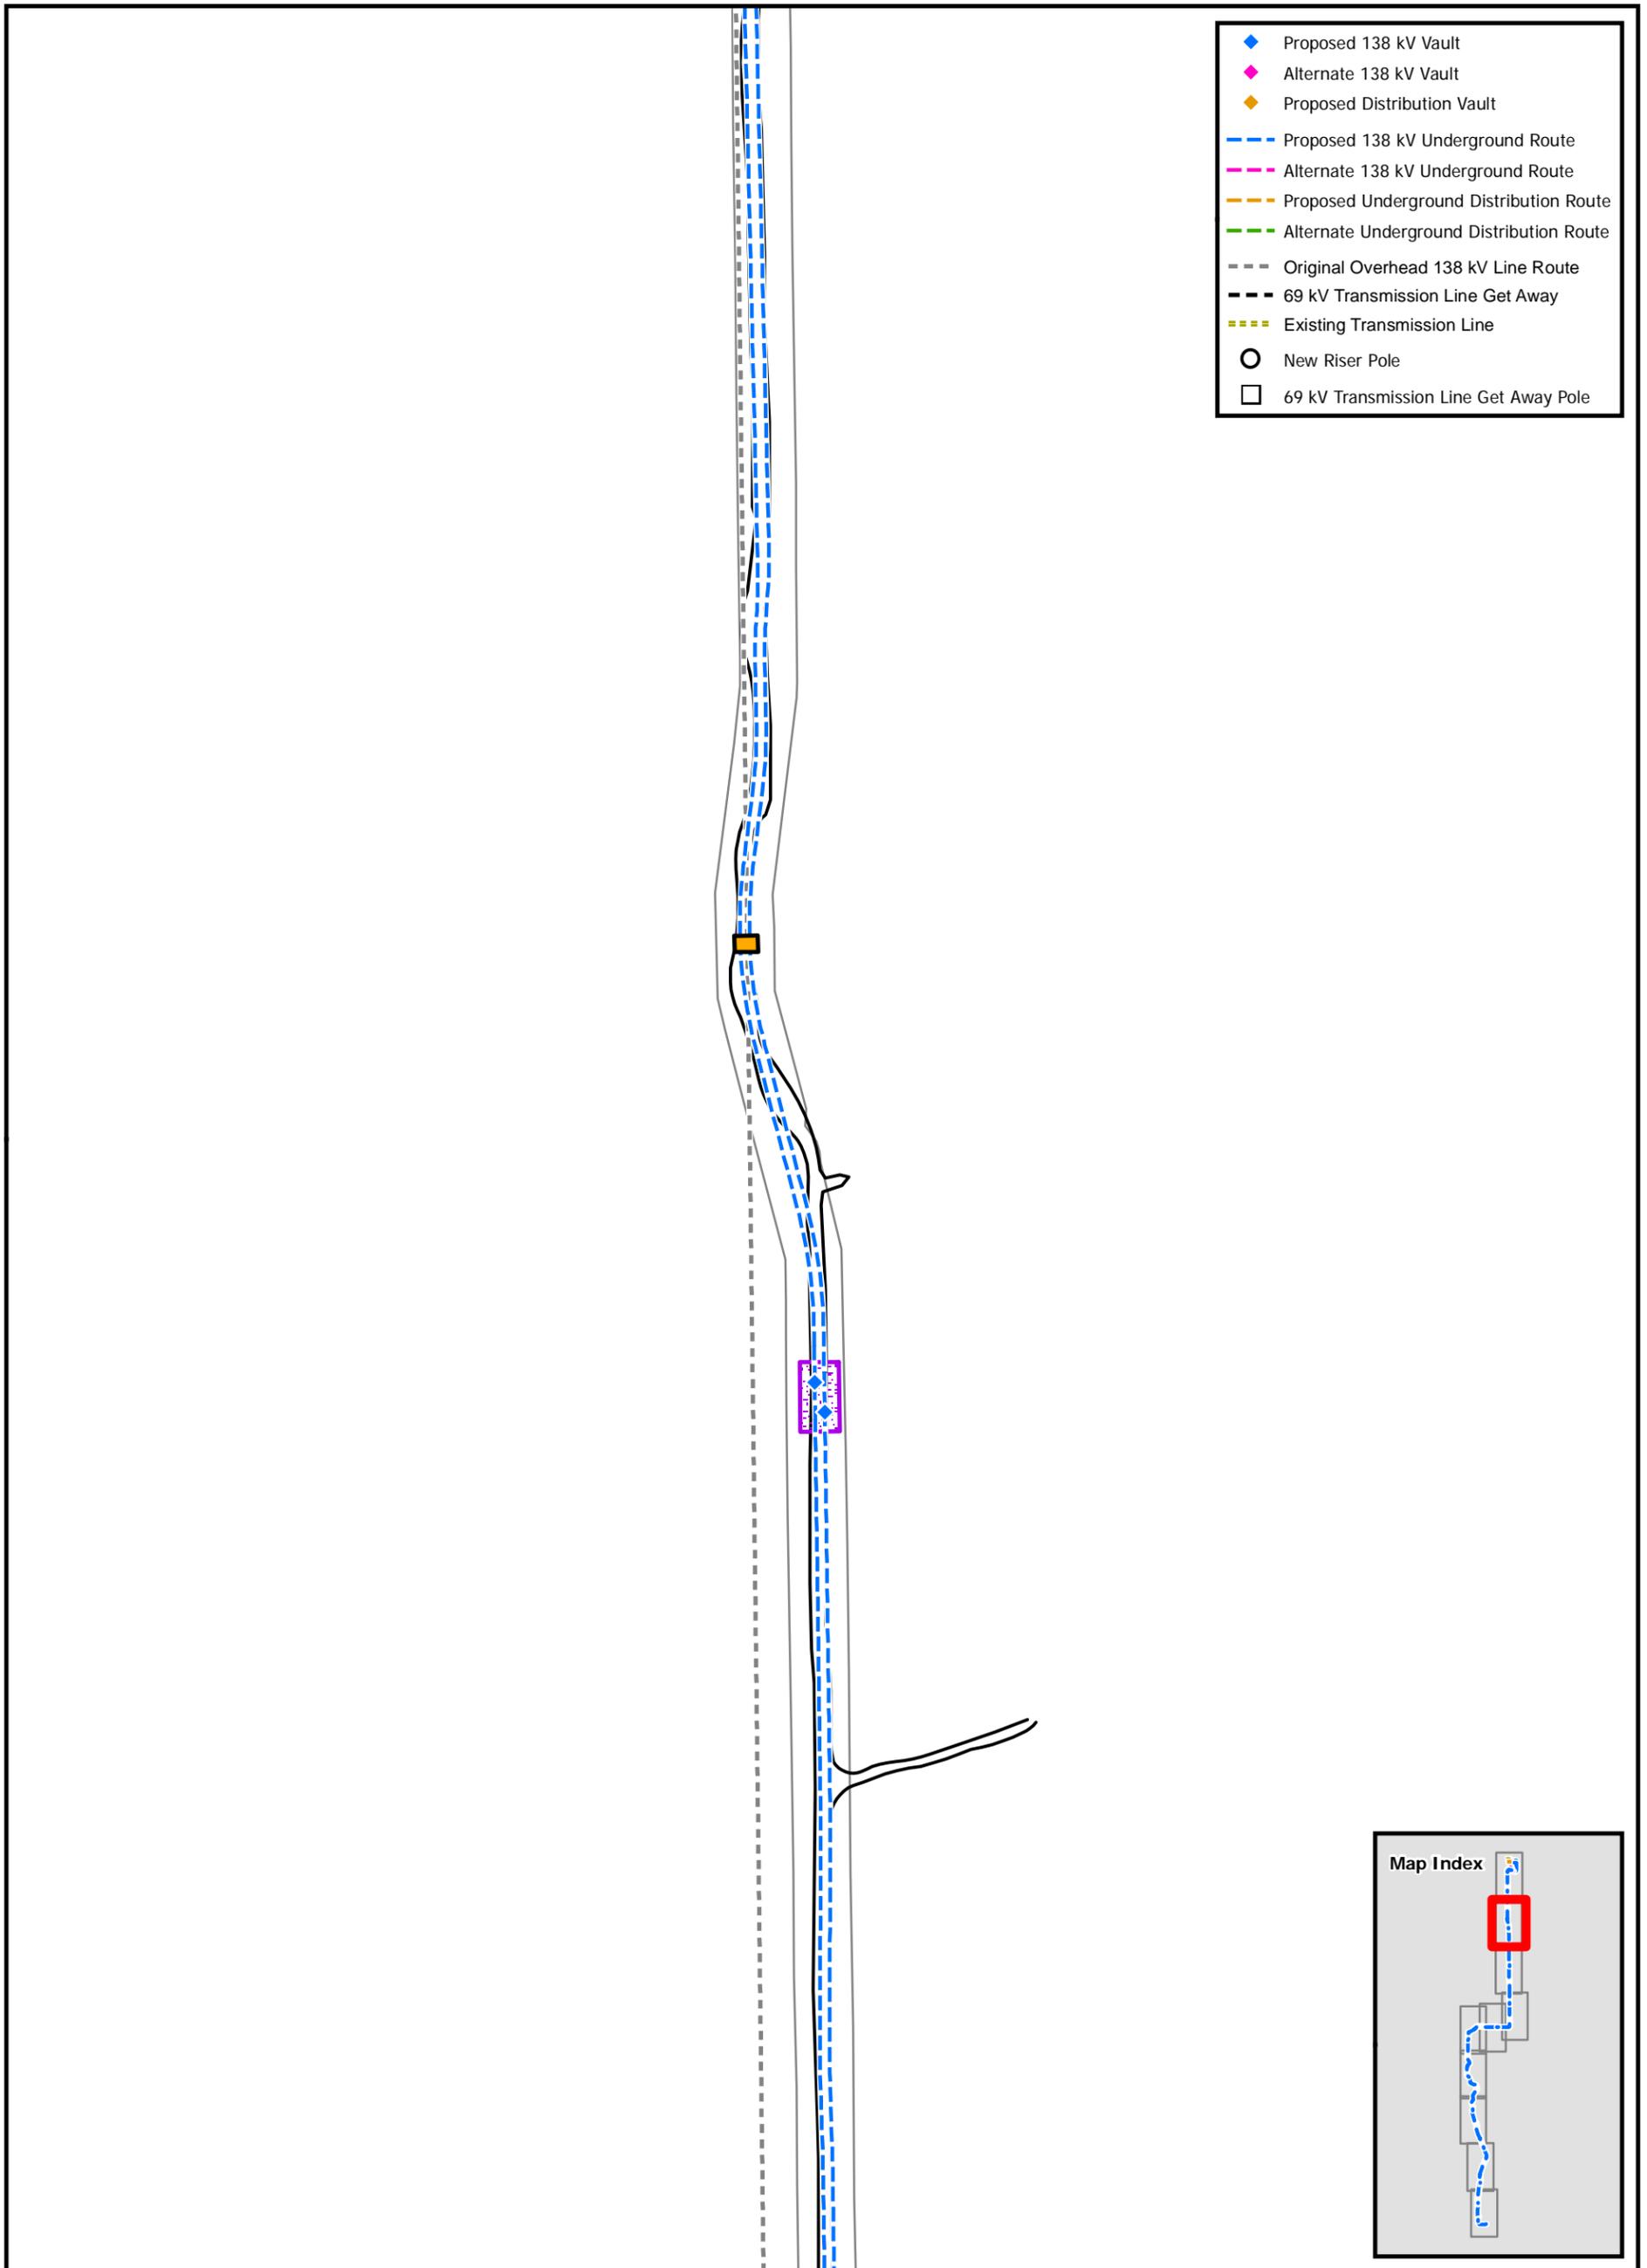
Preliminary Underground Alignment Drawing 2 of 10
